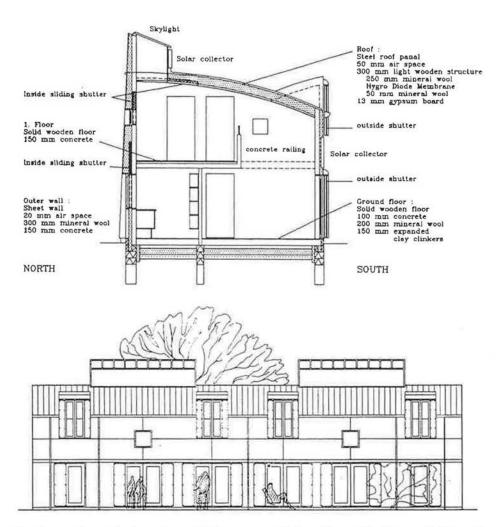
Section and south elevation of House type A (version with shutters). The elevation shows 2 dwellings of a longer row.
